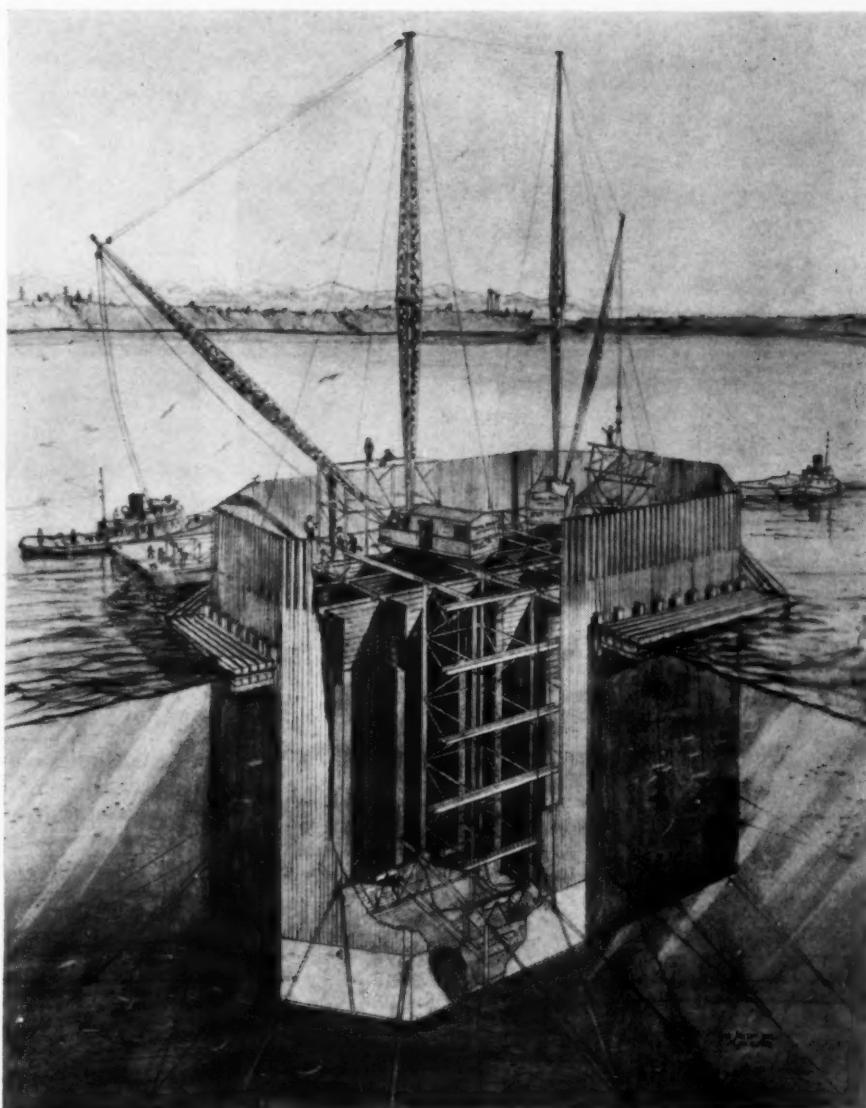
Isometric View of Pier Caisson Showing Main Characteristics of Construction. The Lines Leading Outward Tie to 600-Ton Anchors. Around the Outside Is a Tug Bumping Fender for Construction Protection. The False Bottom Will Be Jerked Out When the Caisson Is Landed. Two Revolving-Power-Plant, Specially-Built, Guy Derricks Which Raise Each Other, Alternately, Handle All Lifting and Placing of Steel, Forms, and Concrete, Besides Taking Up Slack in Anchor Cables as the Caisson Lowers.
